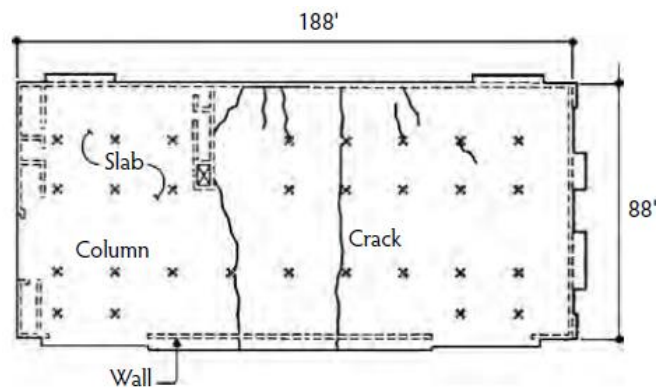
Reflected ceiling showing cracks in slab
